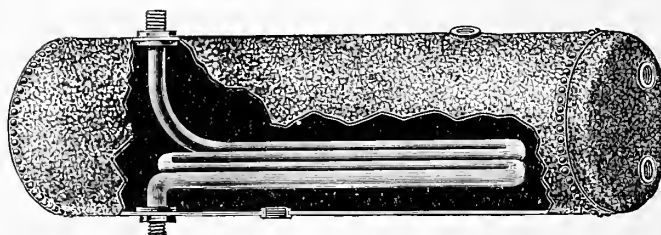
GALVANIZED IRON HORIZONTAL BOILER, WITH COIL, BOTTOM AND TOP CONNECTIONS.
